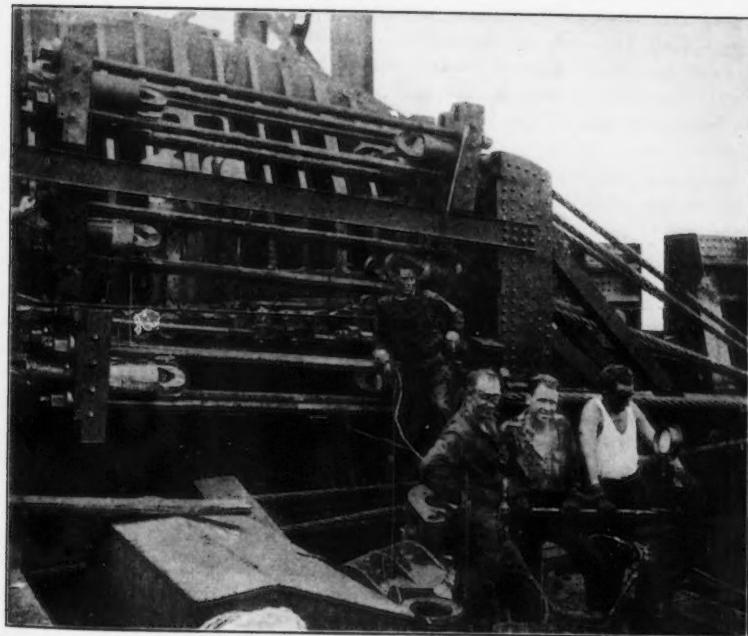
ADJUSTING ROPES IN TOWERS.
